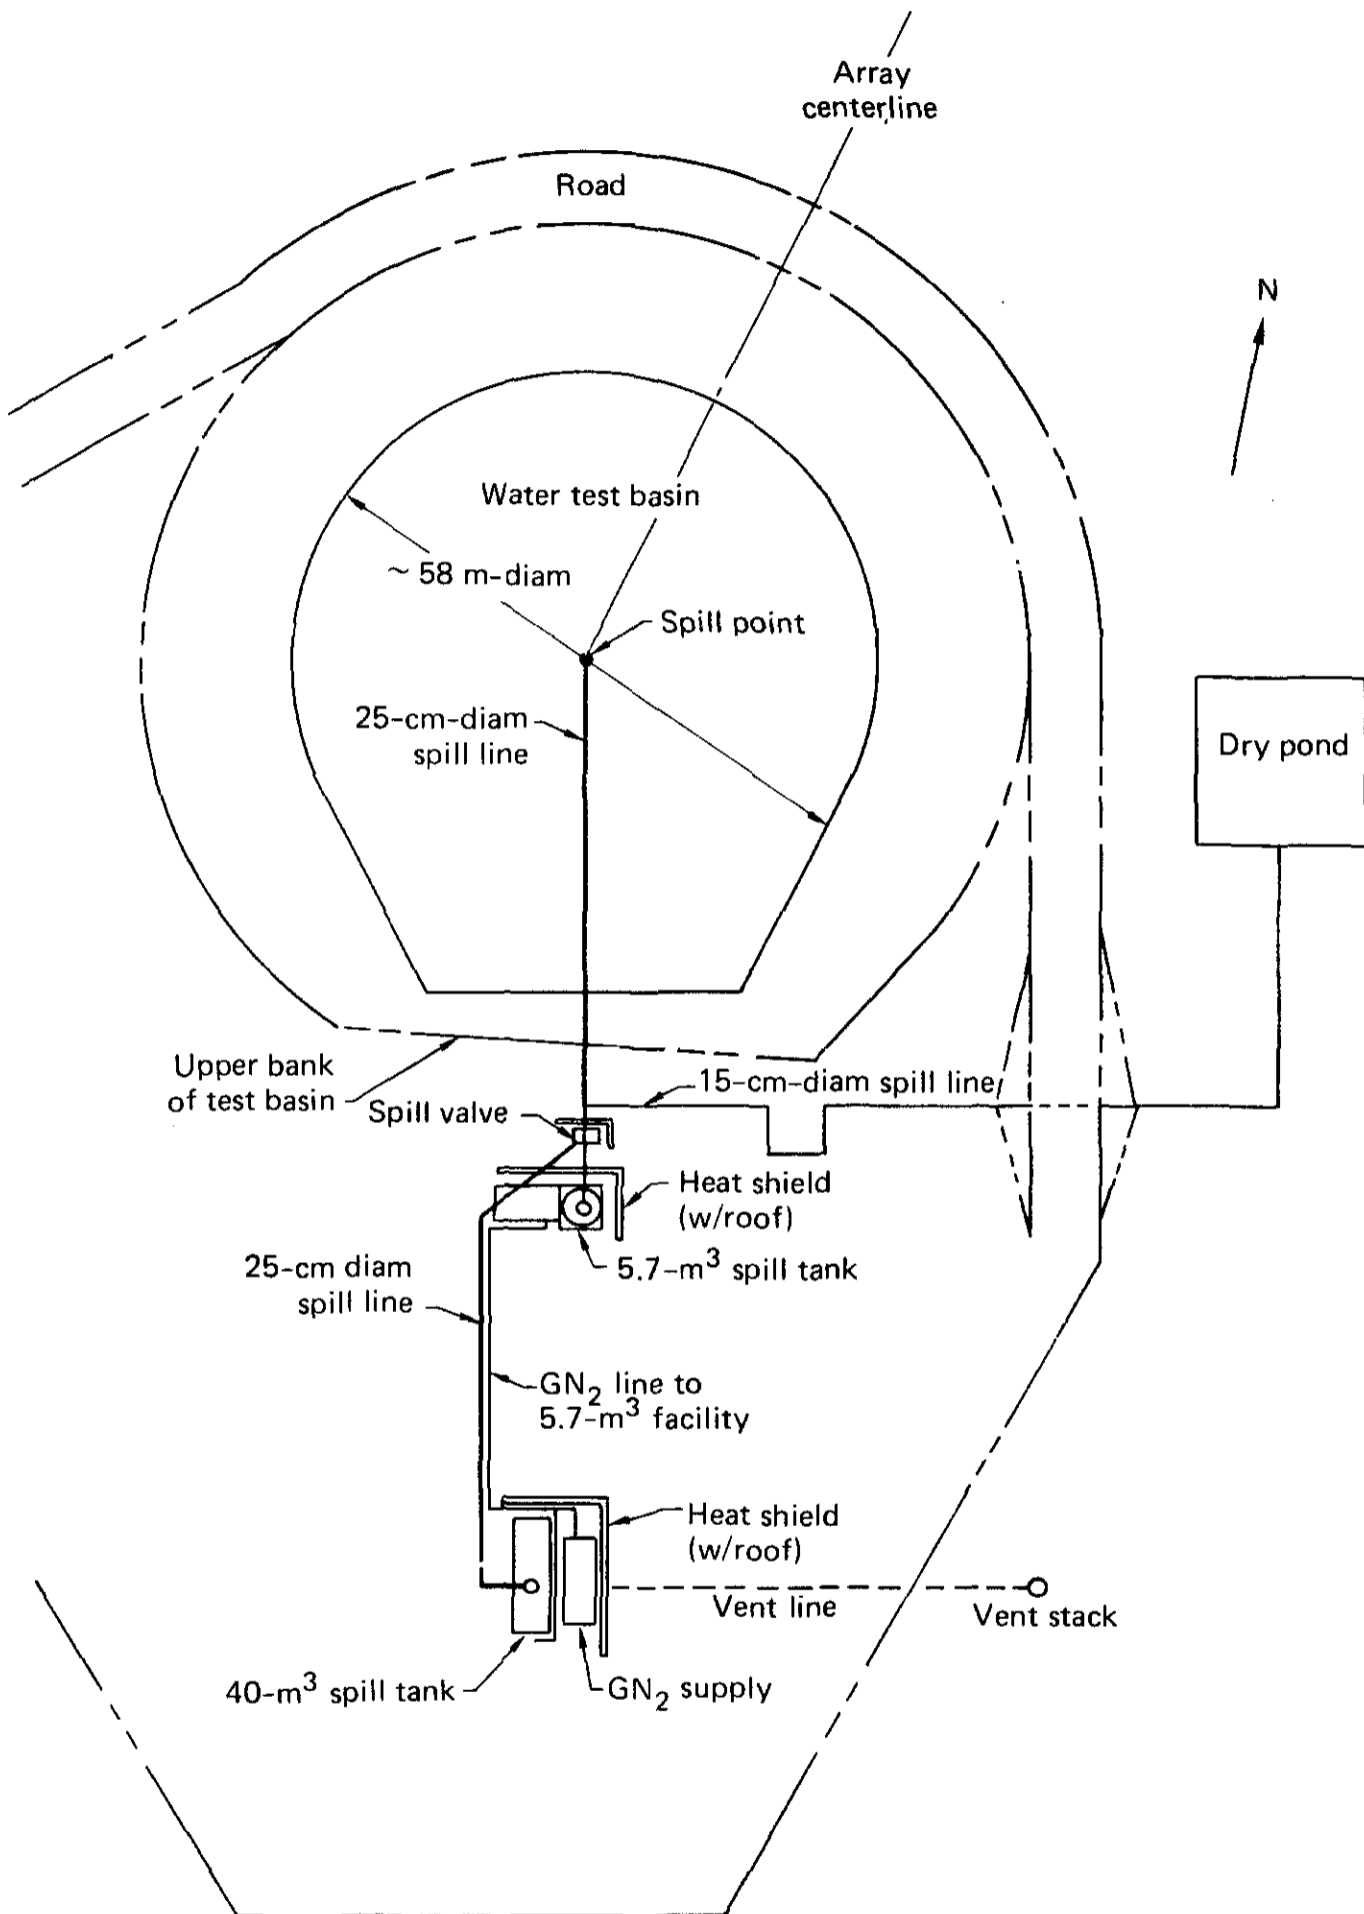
Site plan of Naval Weapons Center (NWC) spill facility at China Lake.
